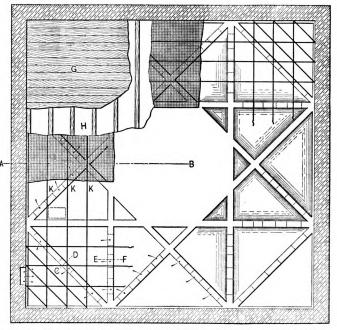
Showing Manner of Constructing Floor.-Scale, 3-16 Inch to the Foot.
